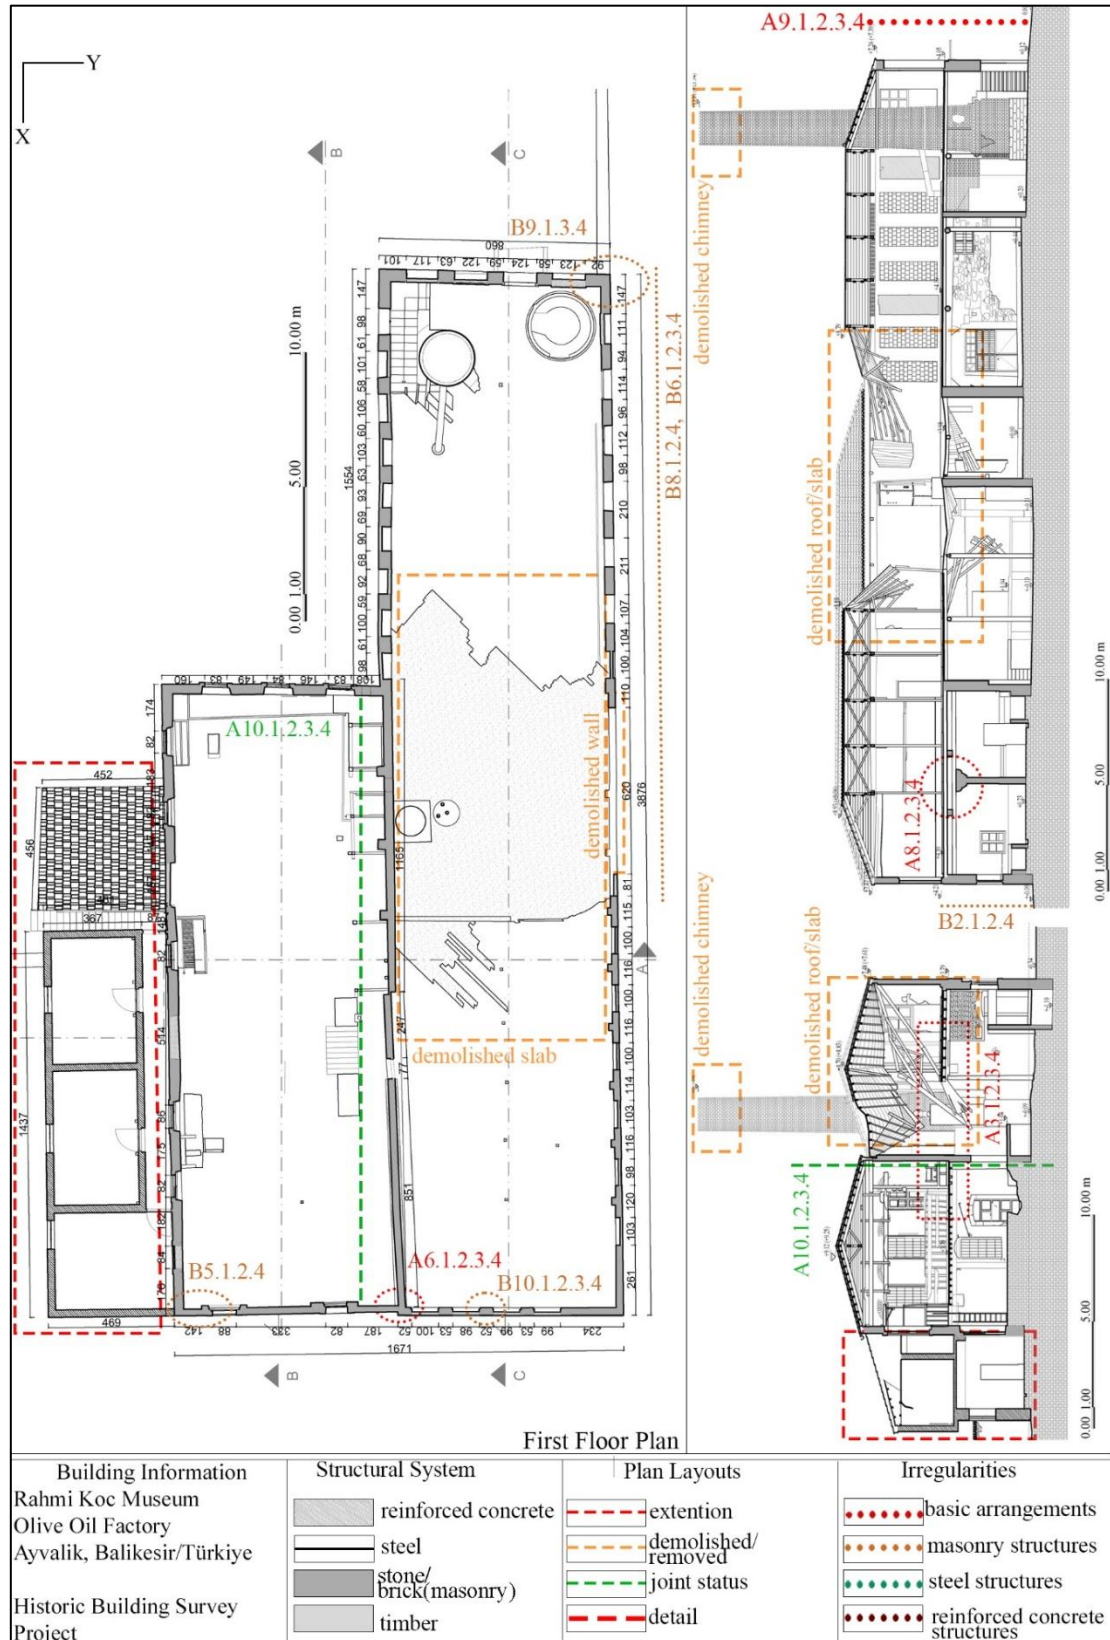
First Floor Plan and Sections (Modified by the author based on EMR Architecture, 2024.)
